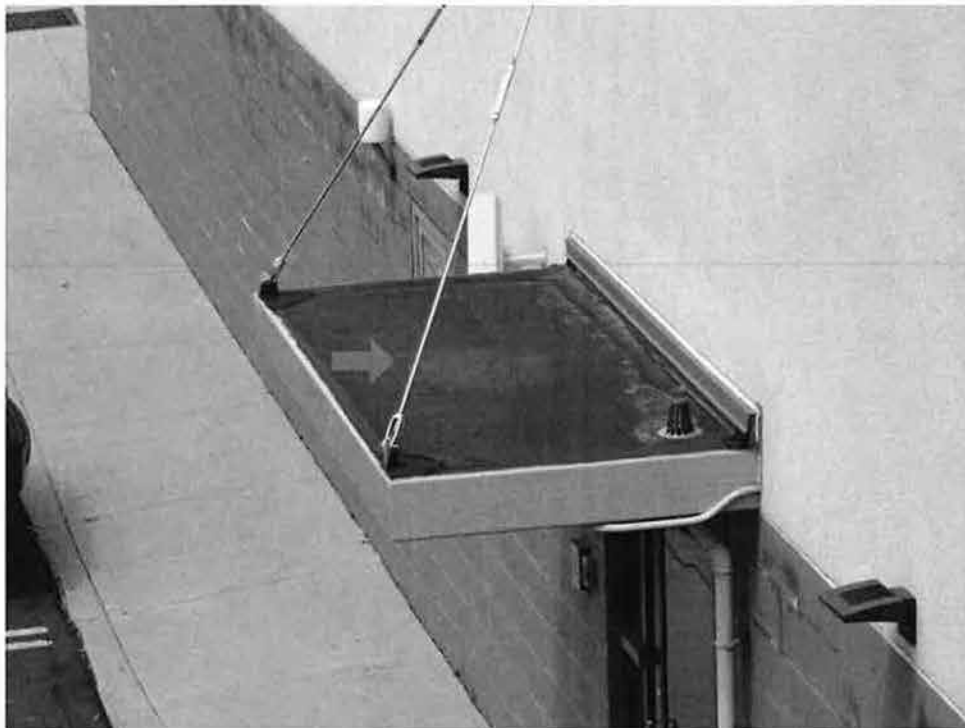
Roof Area F - View of the insulated fully adhered EPDM roof system (red arrow).
